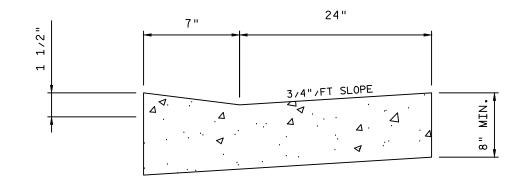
DETAIL FOR REVERSE SLOPED CONCRETE CURB & GUTTER, 4-INCH SLOPED 36-INCH TYPE A OR D MODIFIED
